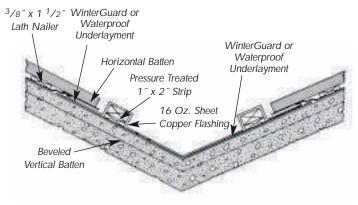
Section Showing Valley Flashing on Poured Concrete Roof Deck
